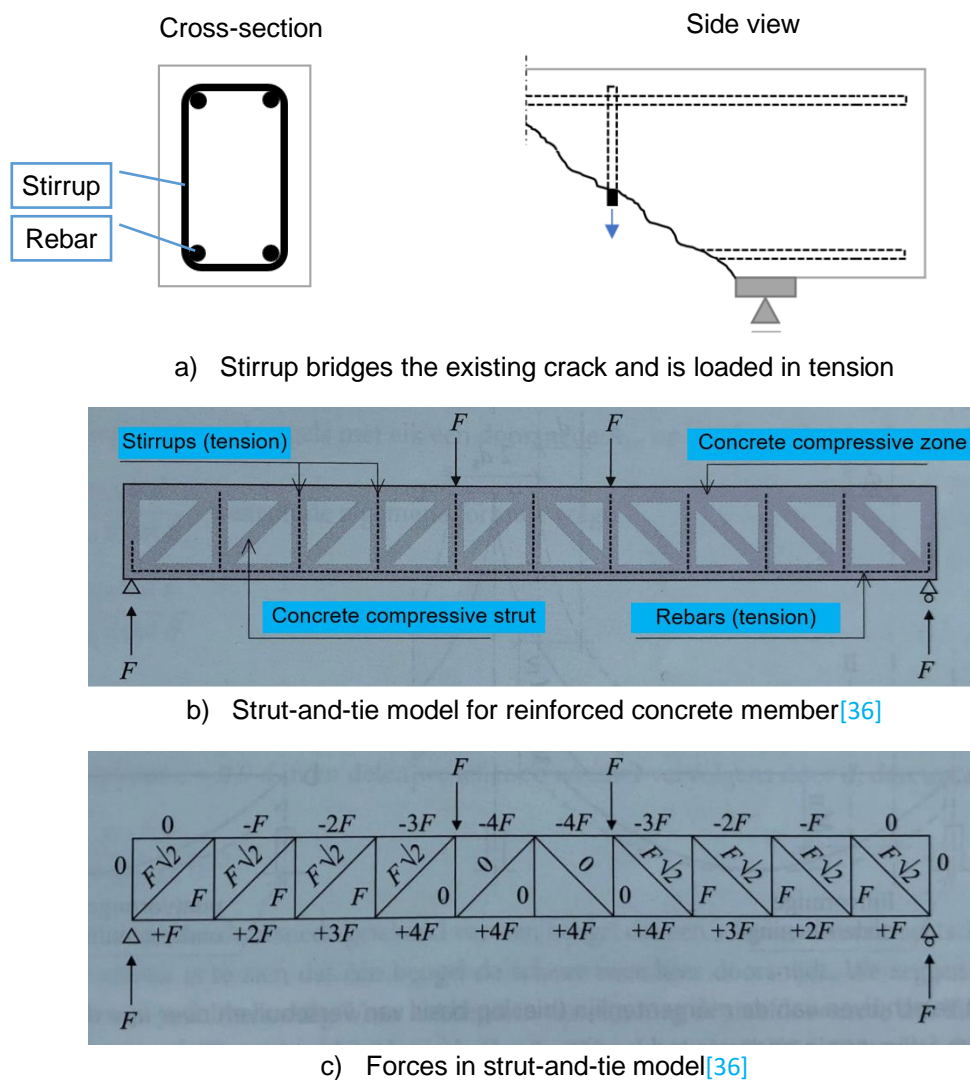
Strut-and-tie model for reinforced concrete beams with stirrups
